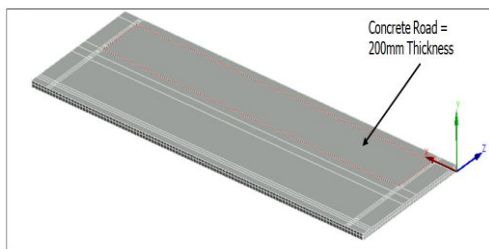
Geometrical Model of 200 mm thick Continuous Reinforced Concrete Pavement Road
